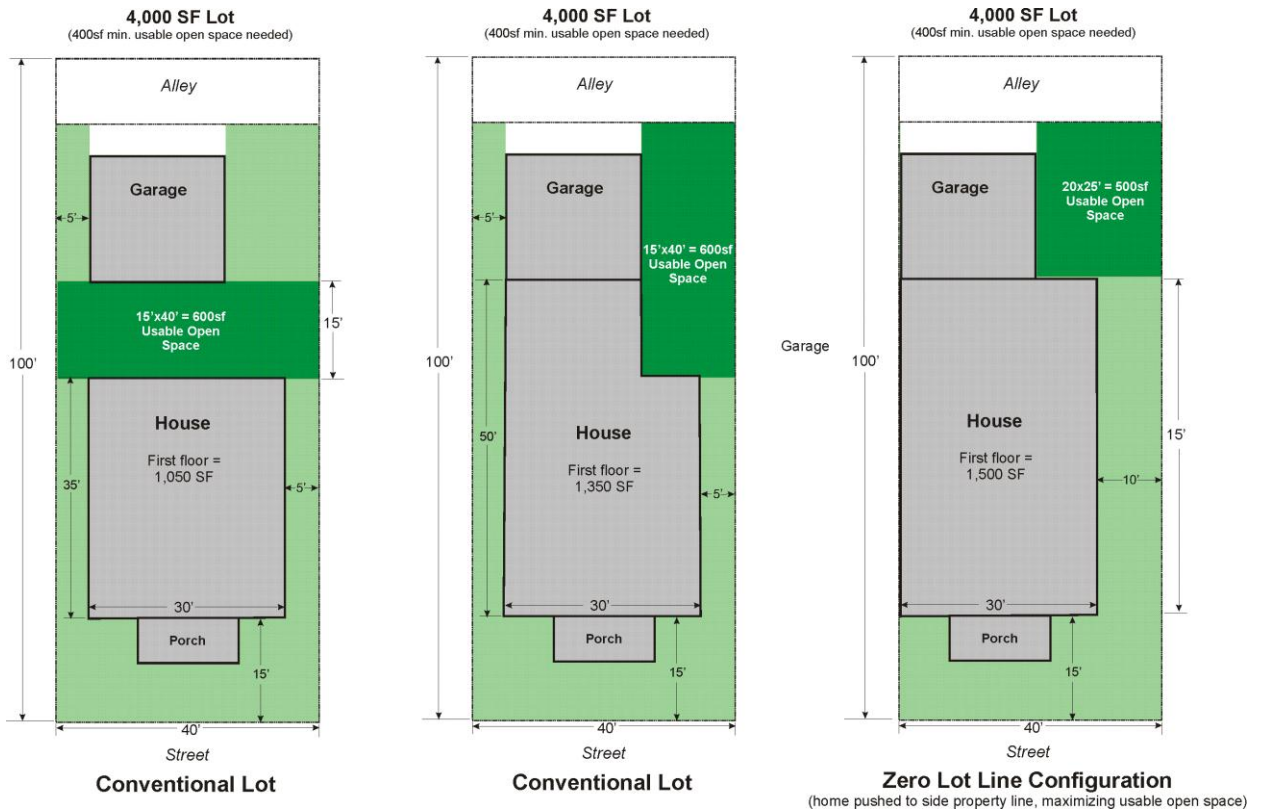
Examples of how usable open space can be configured on small lots. Note how zero lot line configuration (right) allows for a larger open space than in the conventional house layout (middle example) for 4,000 square foot lots.
